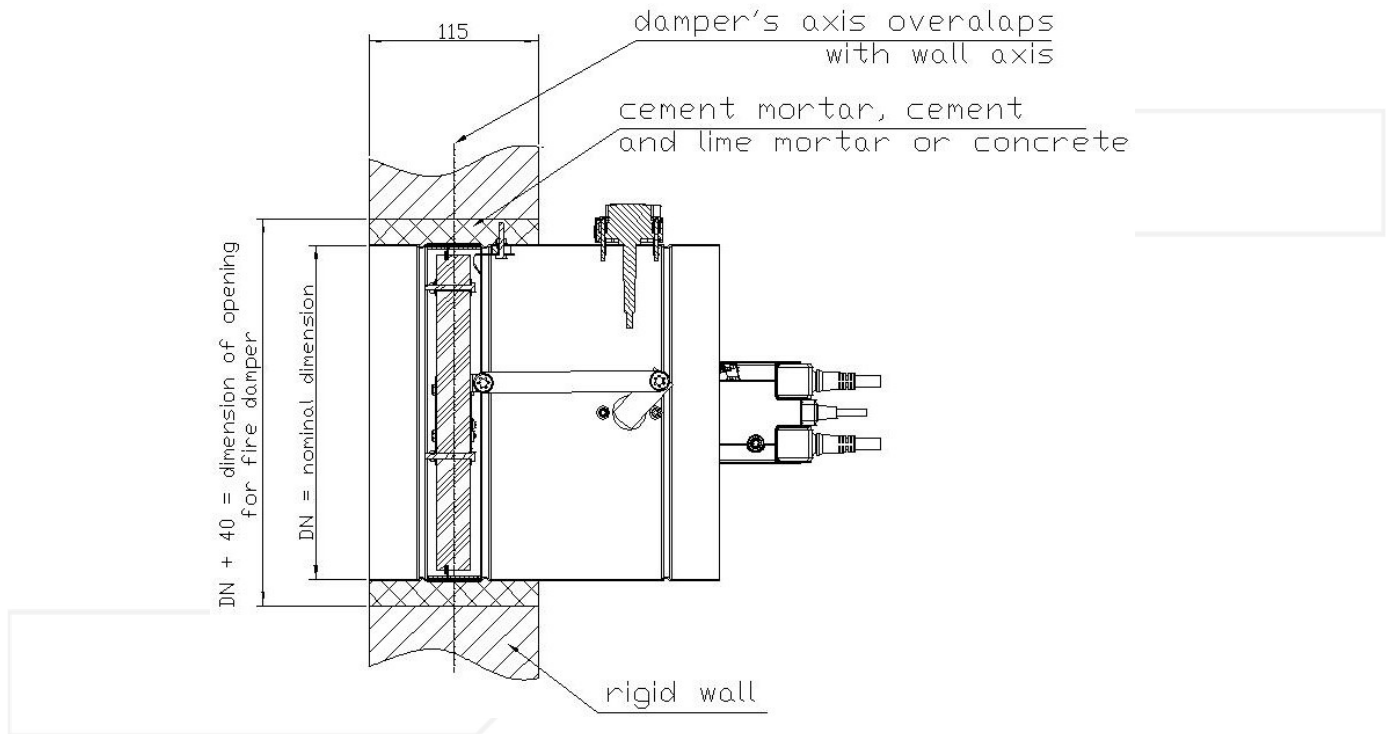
Installation of KTM-O fire dampers in rigid wall with 115 mm thickness
